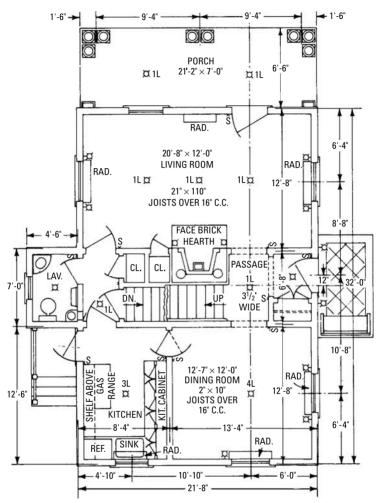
The completed drawing of the first floor with all dimensions and specifications in detail.
